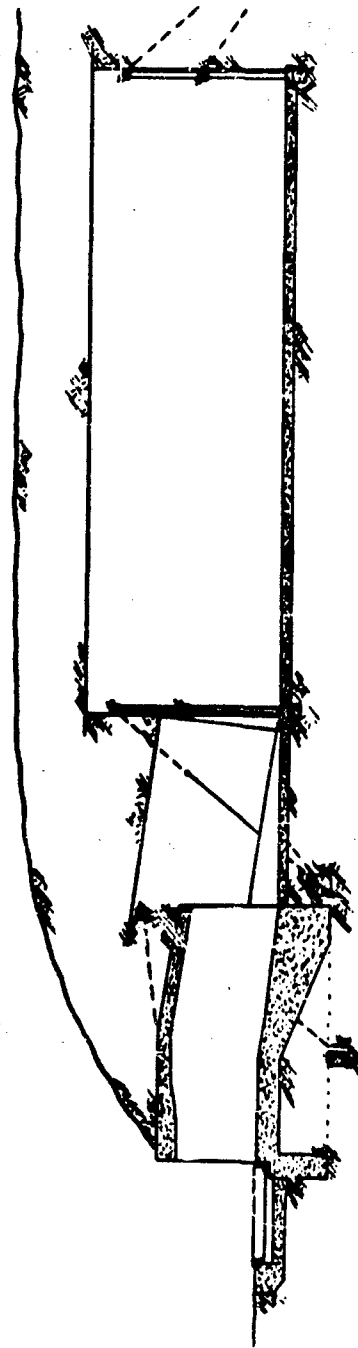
Example of drive-in storage structure: vertical section through centerline.
